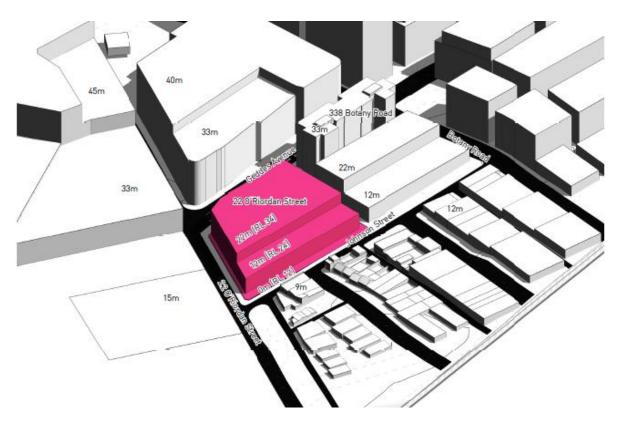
Isometric view of proposed building envelope - looking north-east along O'Riordan Street
